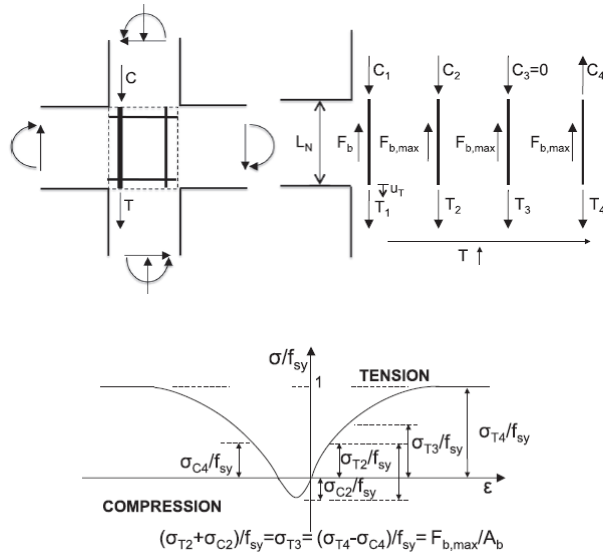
Column longitudinal rebar loss of anchorage in an interior beam-column joint; (Laterza et al., 2017).
